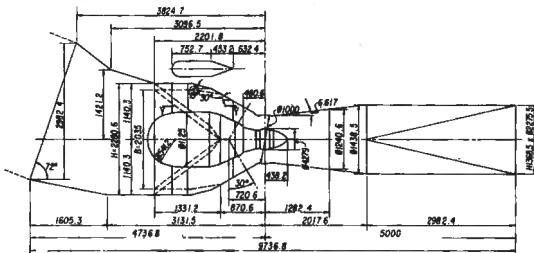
Standard Bulb-Turbine Flow Passage Dimensions (Fuji Electric Co.)
